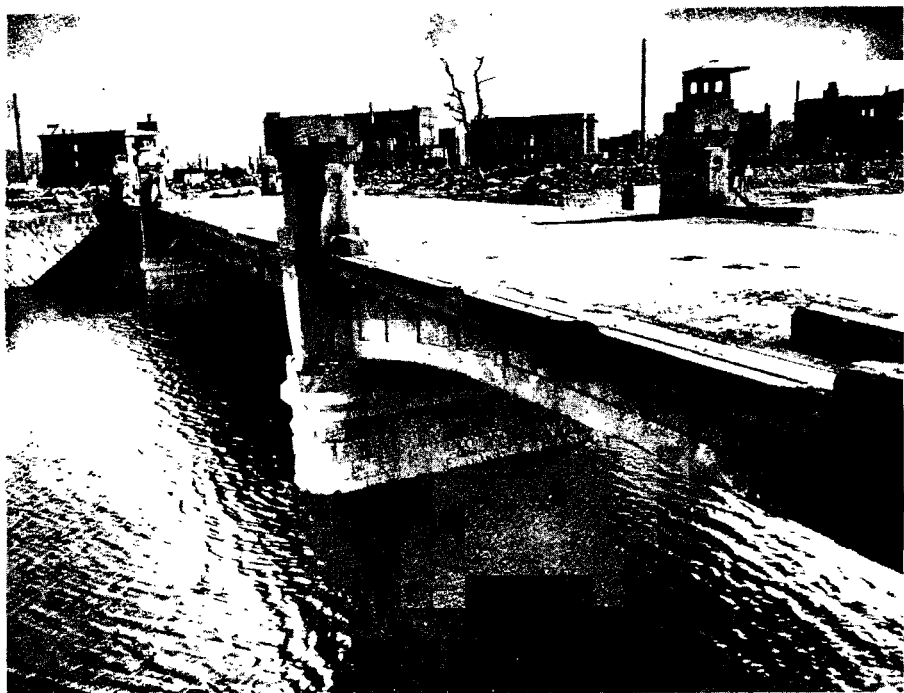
Bridge with deck of reinforced concrete on steel-plate girders; outer girder had concrete facing (270 feet from ground zero at Hiroshima). The railing was blown down but the deck received little damage so that traffic continued.
